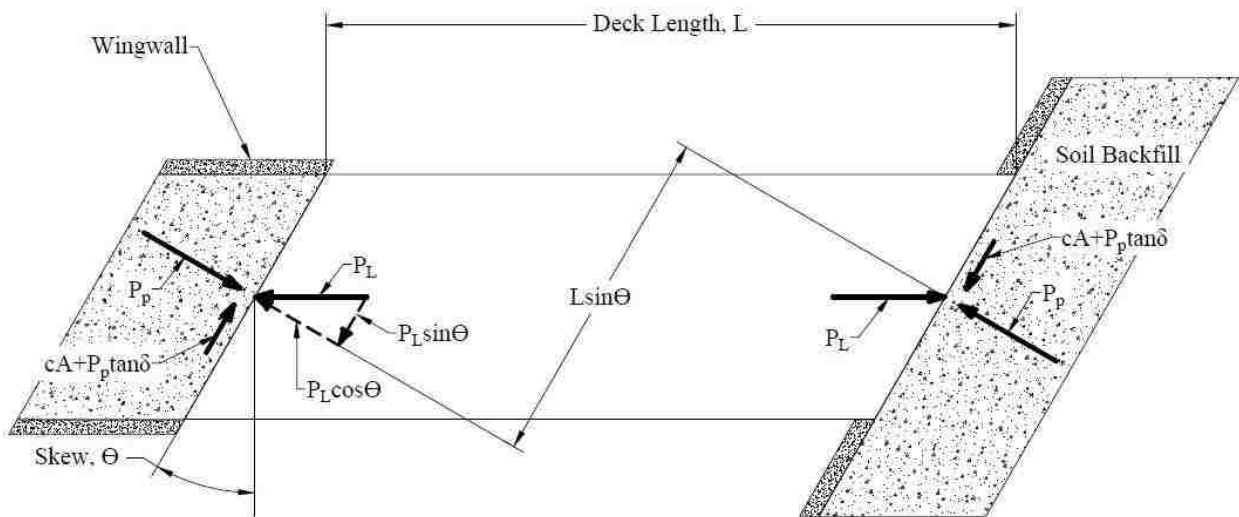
Typical distribution of forces on a bridge with skewed abutments, adapted from Burke, Jr. (1994).
